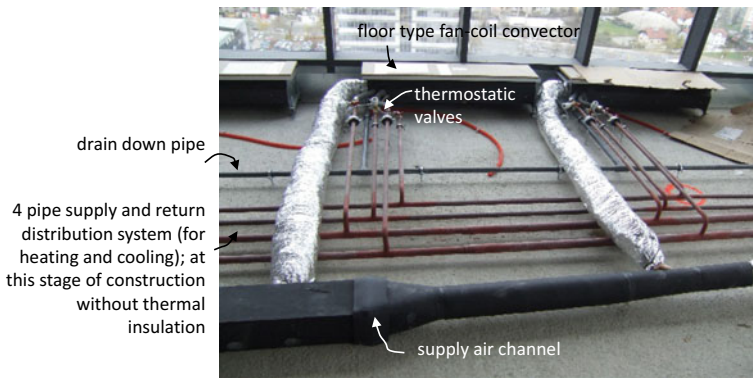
Fan-coils for heating, cooling and ventilation in office building
